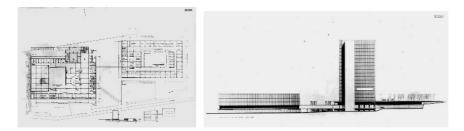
General Directorate of State Water Works in Ankara, Mention, 1959, plan and west elevation.
